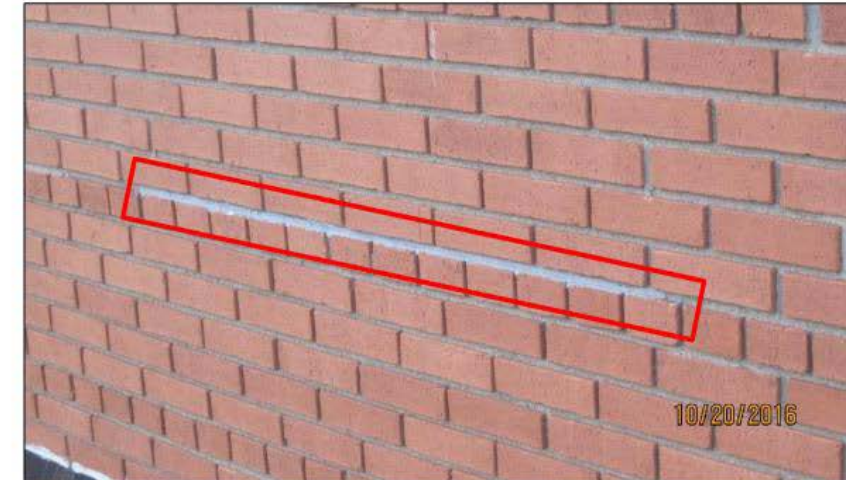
Same elevation as Figure 20, a secondary sealant has been added to mortar joints in multiple locations.
